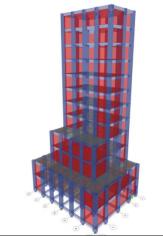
Isometric View for Model 1 with Shear wall Area to Floor Area Ratio 1
